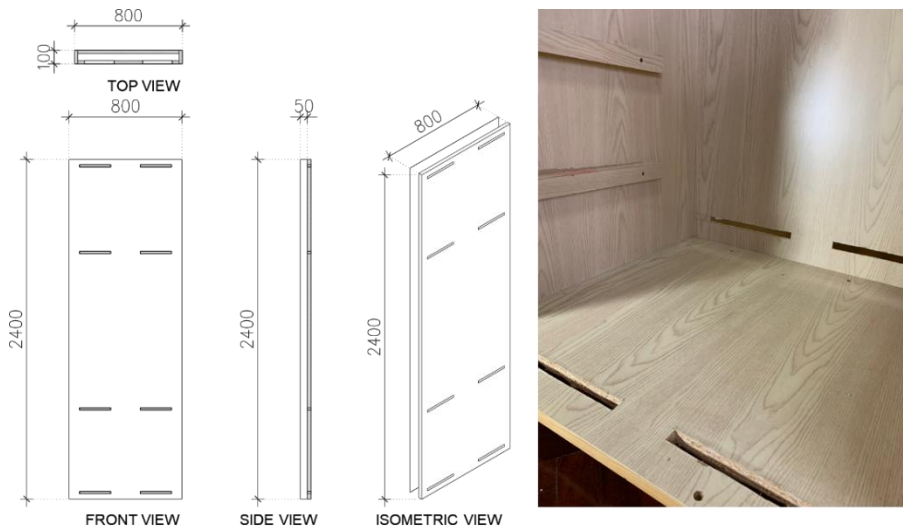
Dimension and Position of Opening in the Air Gap (millimeter)
